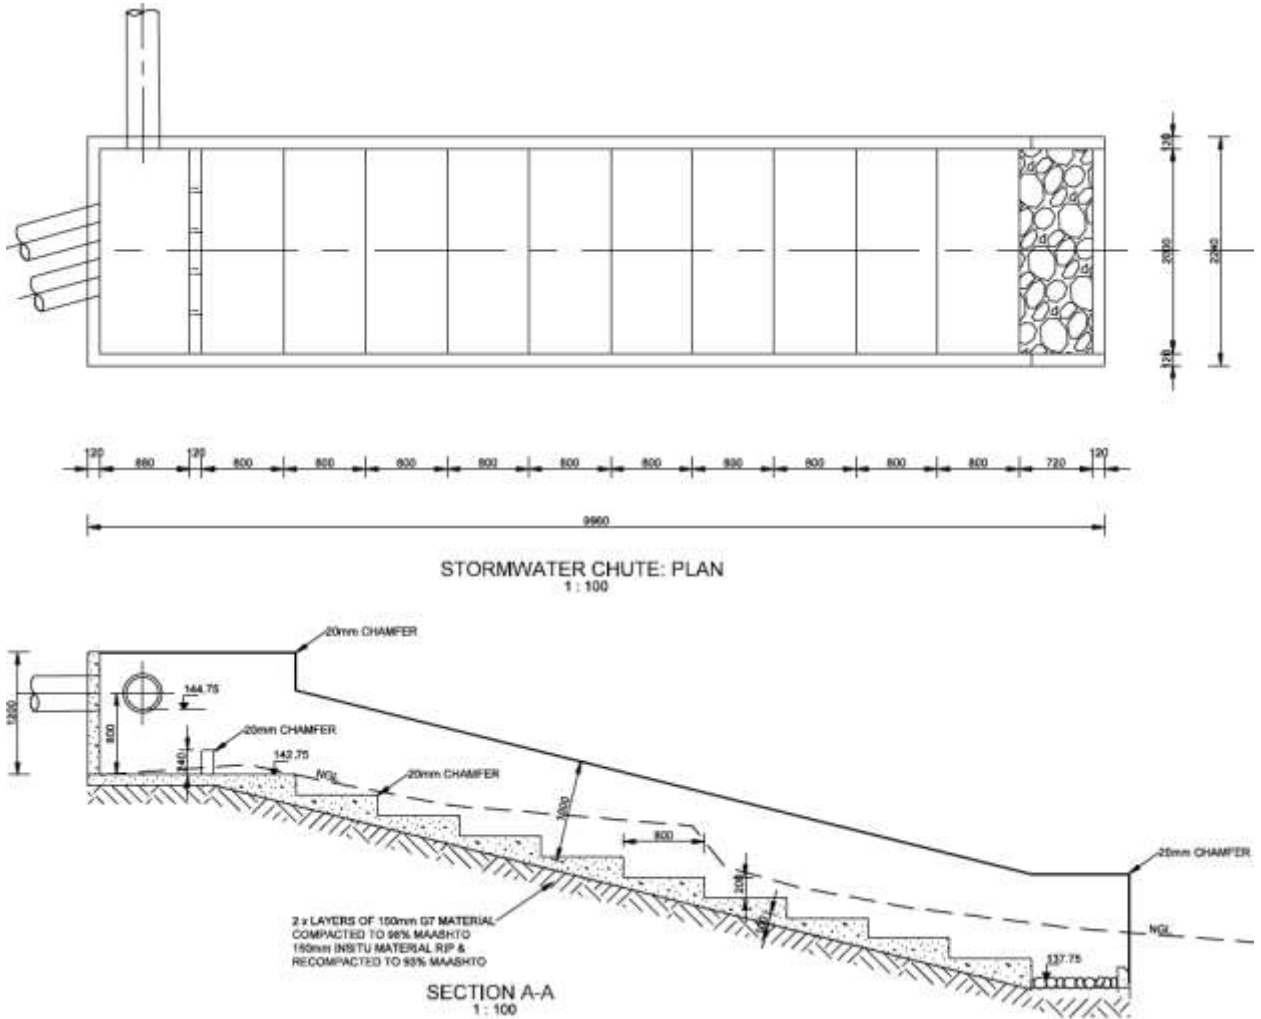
Stepped Conveyance Channel Plan & Cross Section.
